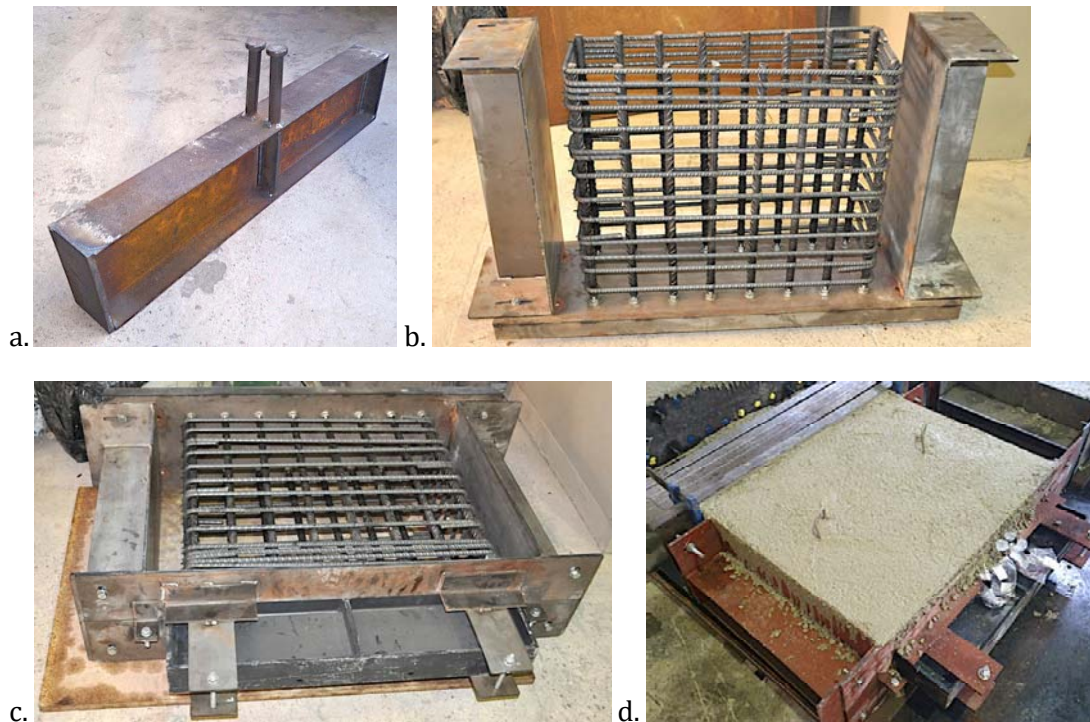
Specimen production. a) steel beam with welded headed stud anchors, b) reinforcement of the specimens and steel form, c) steel beam with headed stud anchors and steel cage before pouring the concrete. d) specimen after pouring the concrete.
